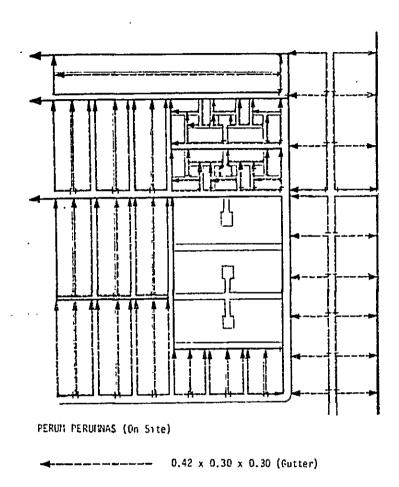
TYPICAL PLAN OF OPEN GUTTERS
